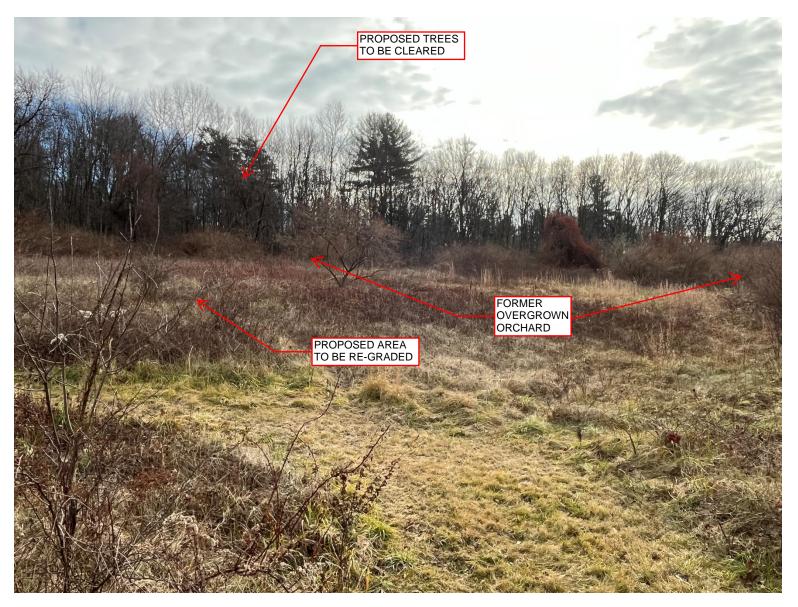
VIEW OF SOUTHEAST CORNER OF PROJECT SITE WHERE TREE CLEARING AND RE-GRADING SLOPES IS PROPOSED
